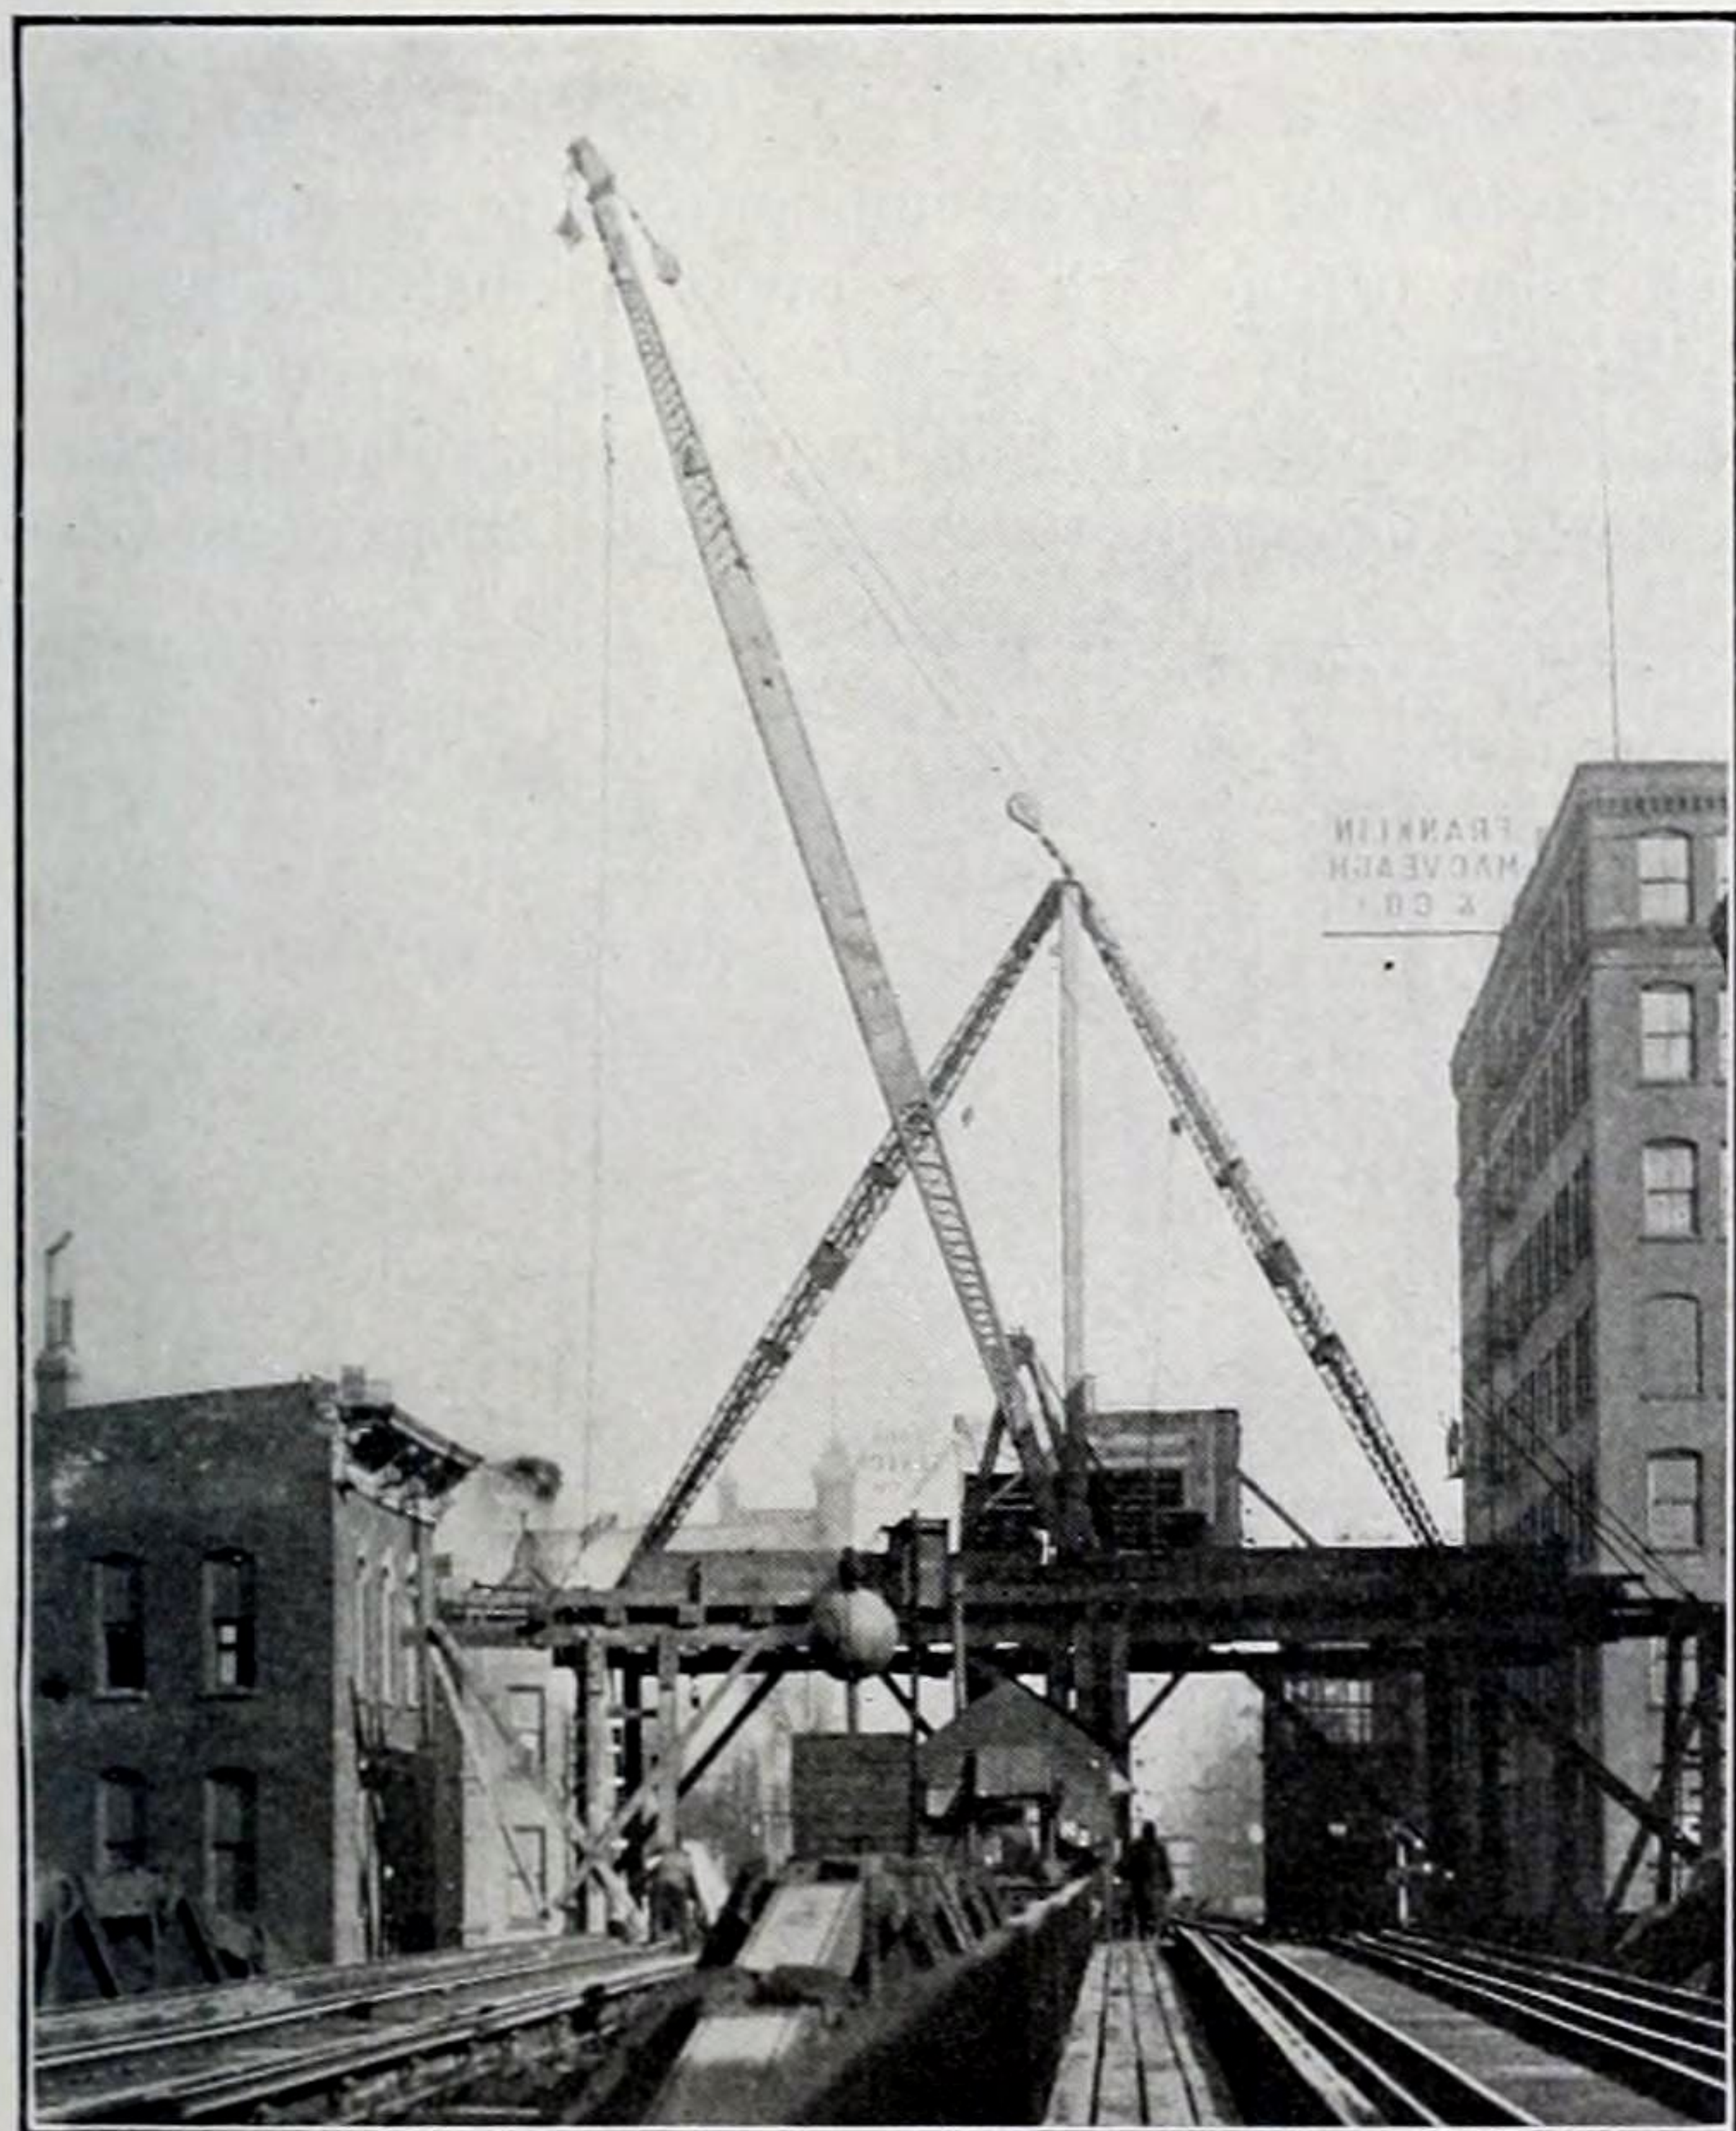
STIFF-LEG DERRICK OVER THE ELEVATED RAILWAY APPROACH
